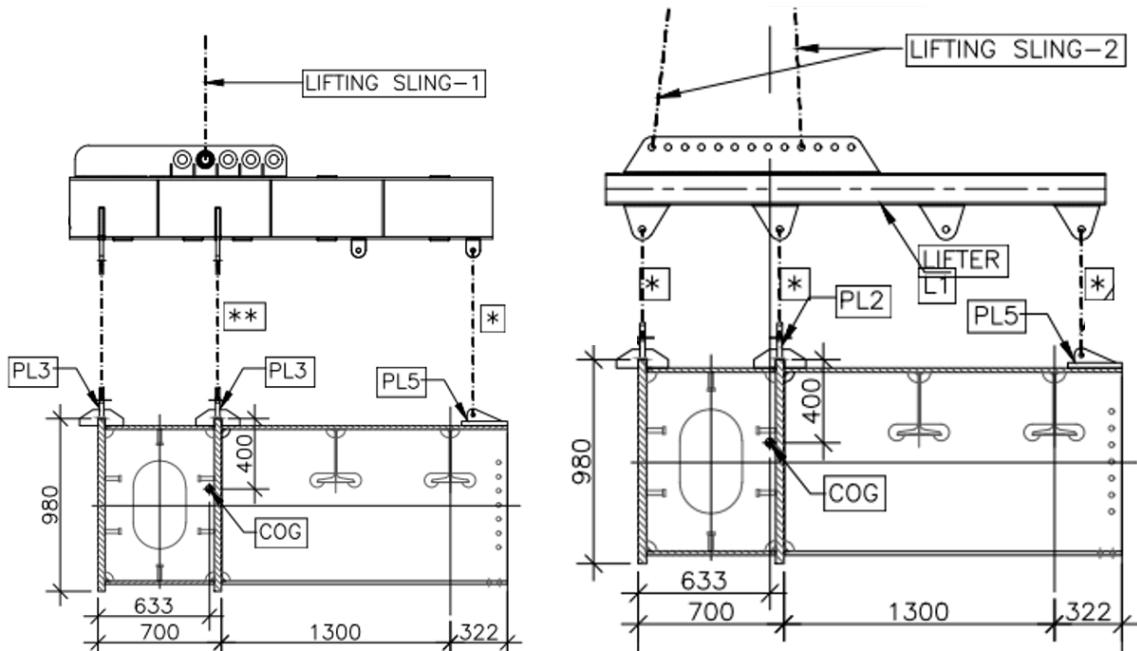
Typical lifting arrangement of the split arch segments in cross section
